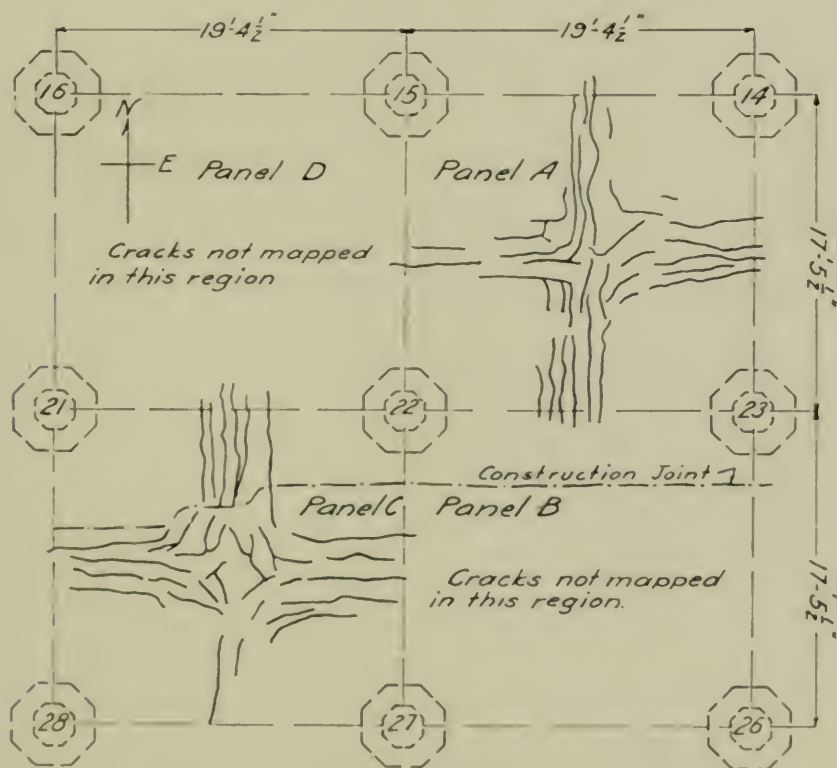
LOCATION OF MAIN CRACKS IN LOWER SIDE OF SLAB
